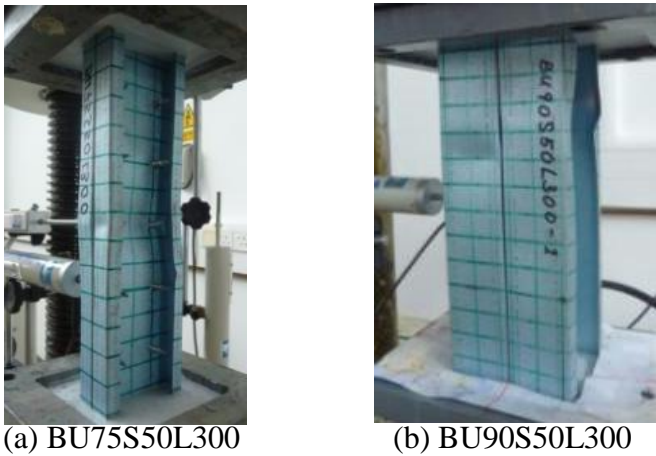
Failure Modes of Tested S50L300 Built-up Columns
